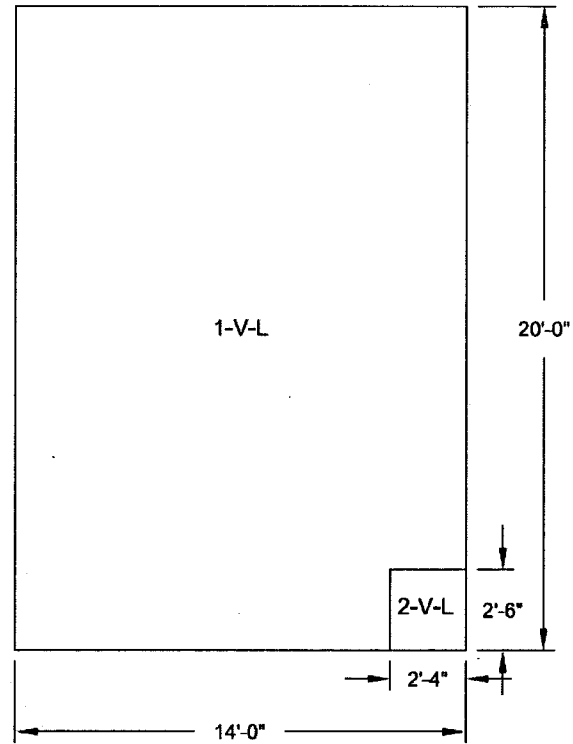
H.6-175 Wall 9 Looking From Outside
